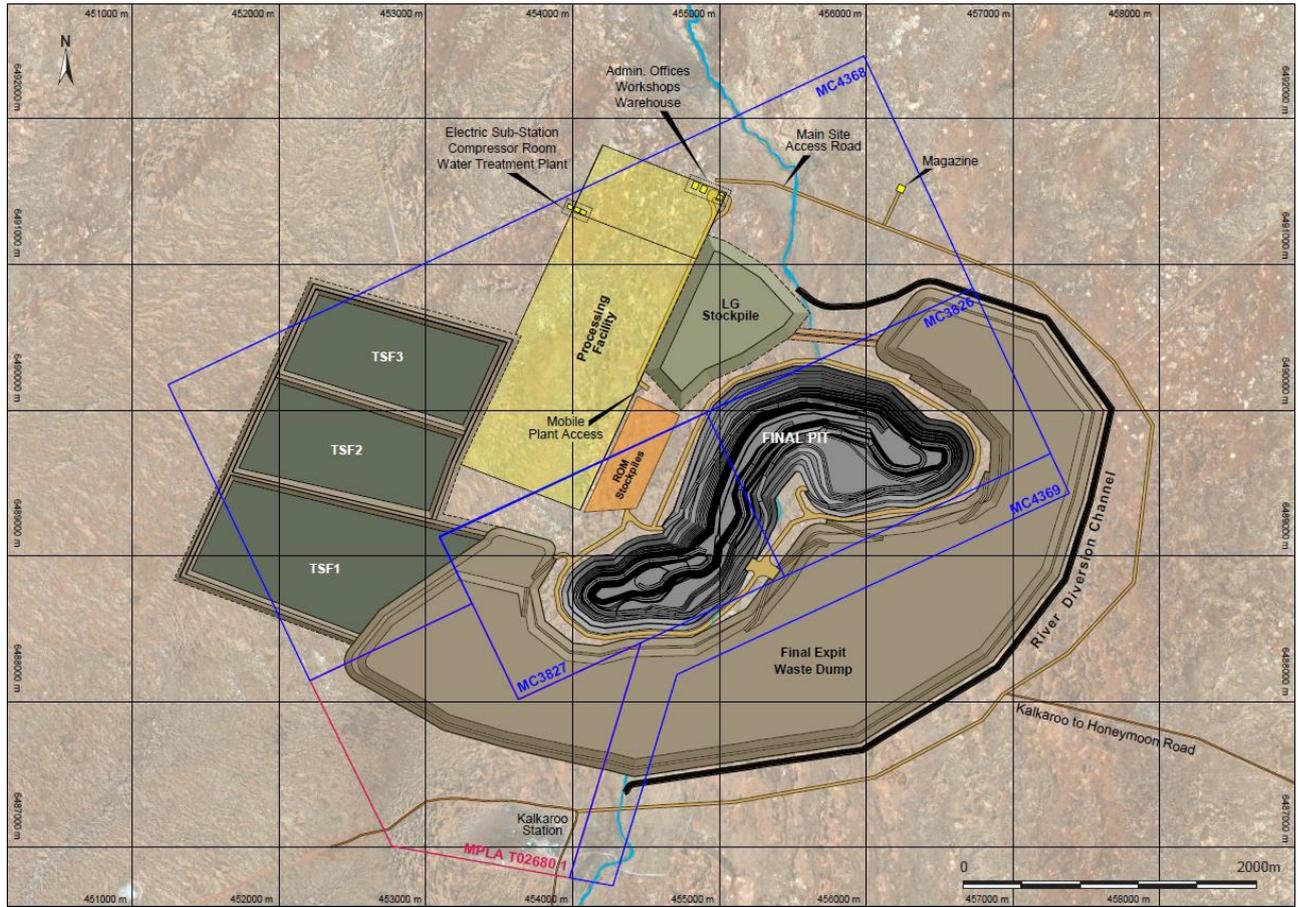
Kalkaroo site layout showing the final open pit outline and other mining infrastructure.
